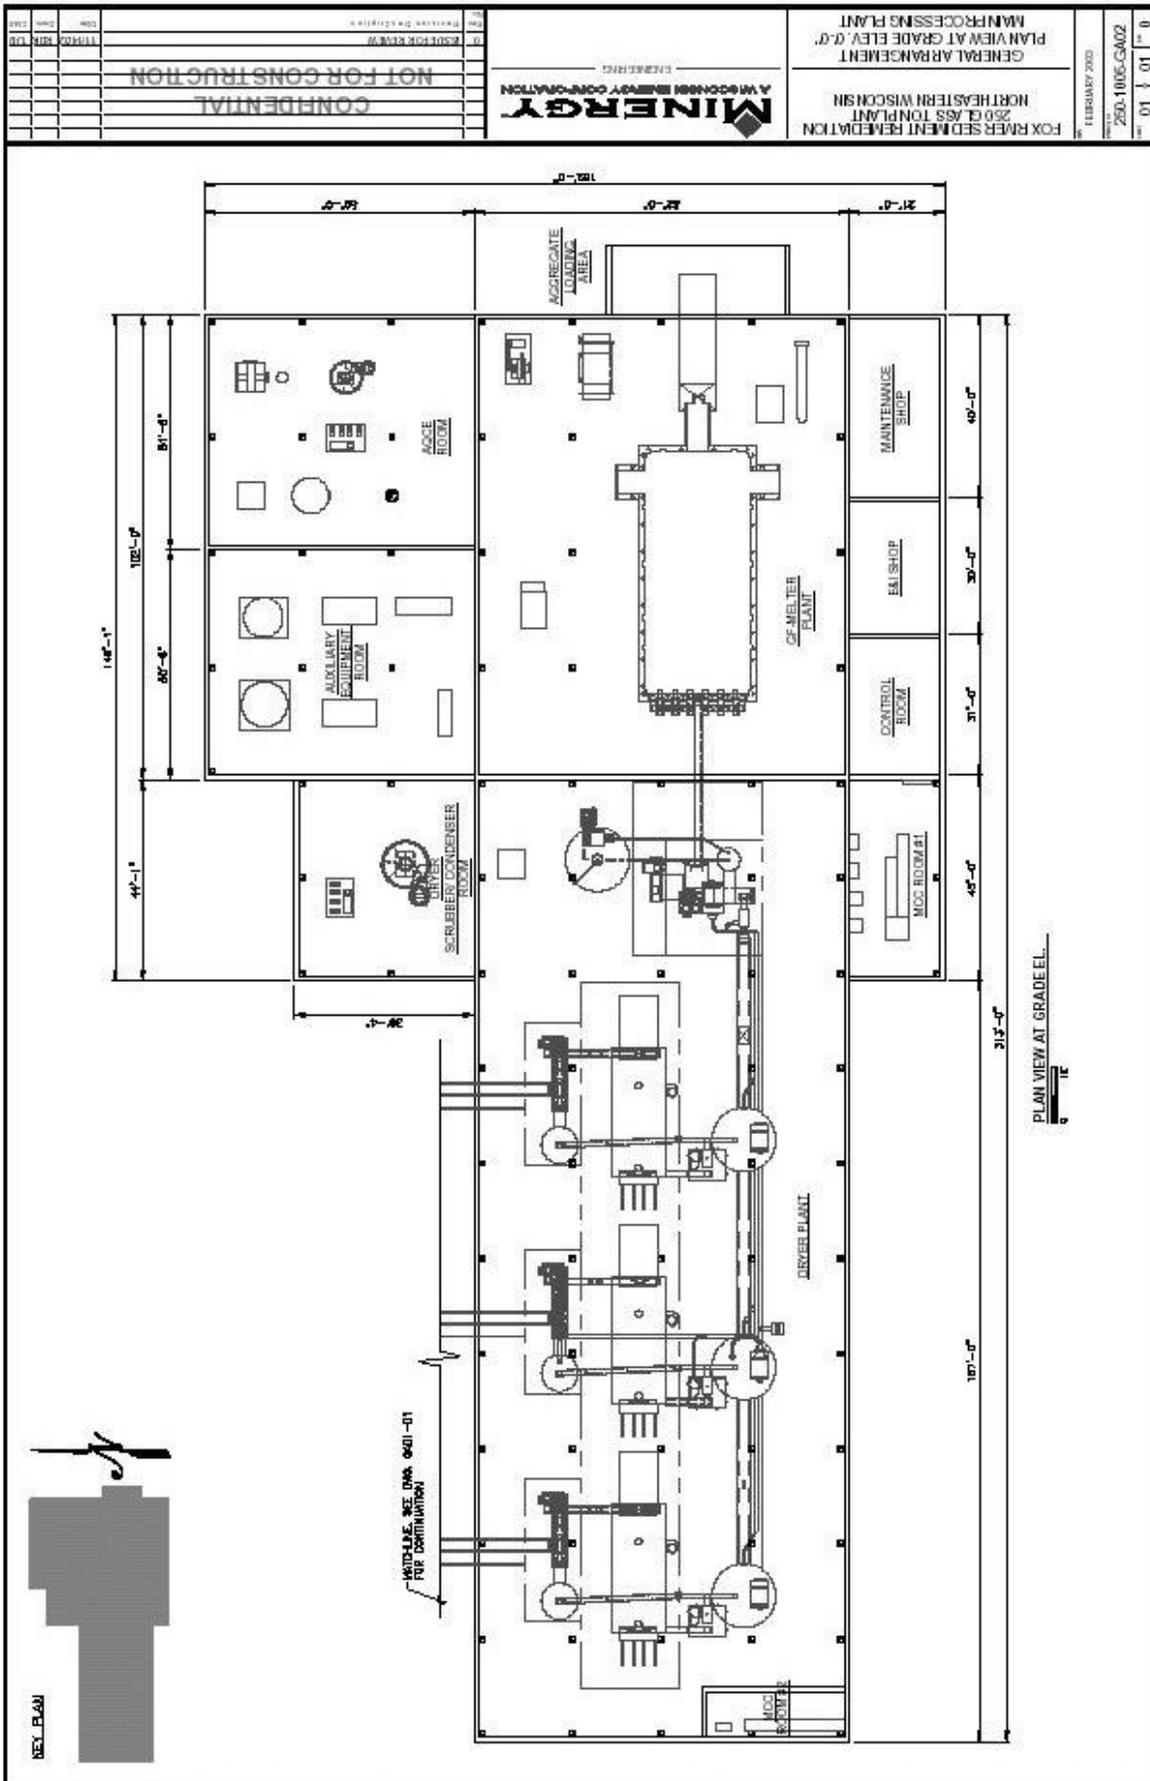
General Plant Arrangement of 250 Glass Ton/Day Facility
